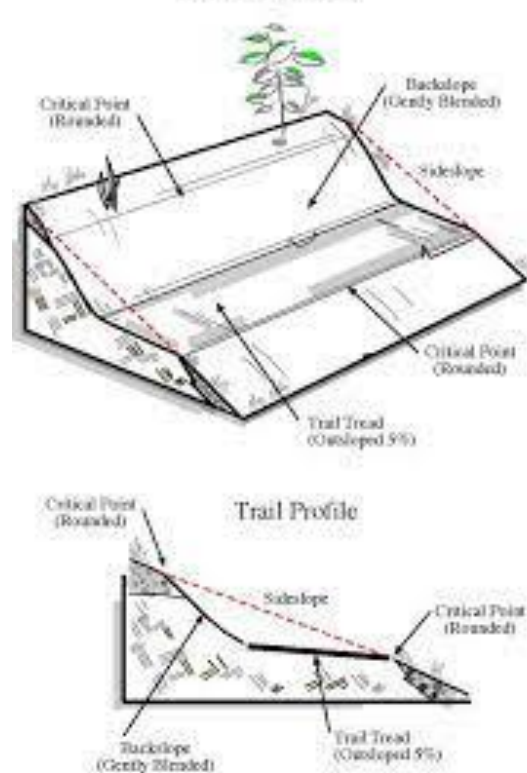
Full Bench Construction TechniqueFigure 3 Full Bench Profile
